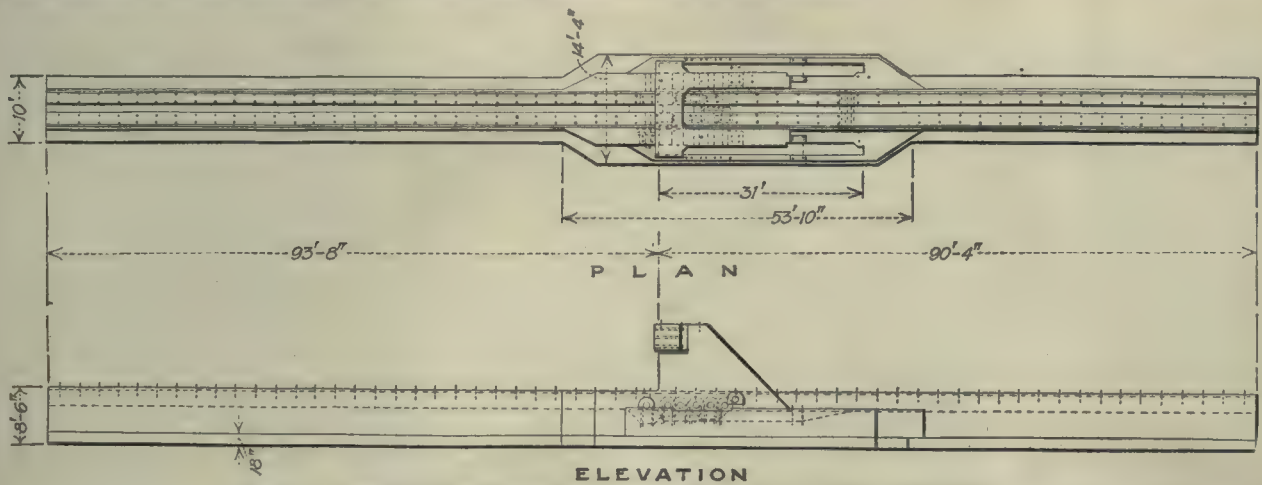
DETAILS OF REINFORCED-CONCRETE PLANING MACHINE
